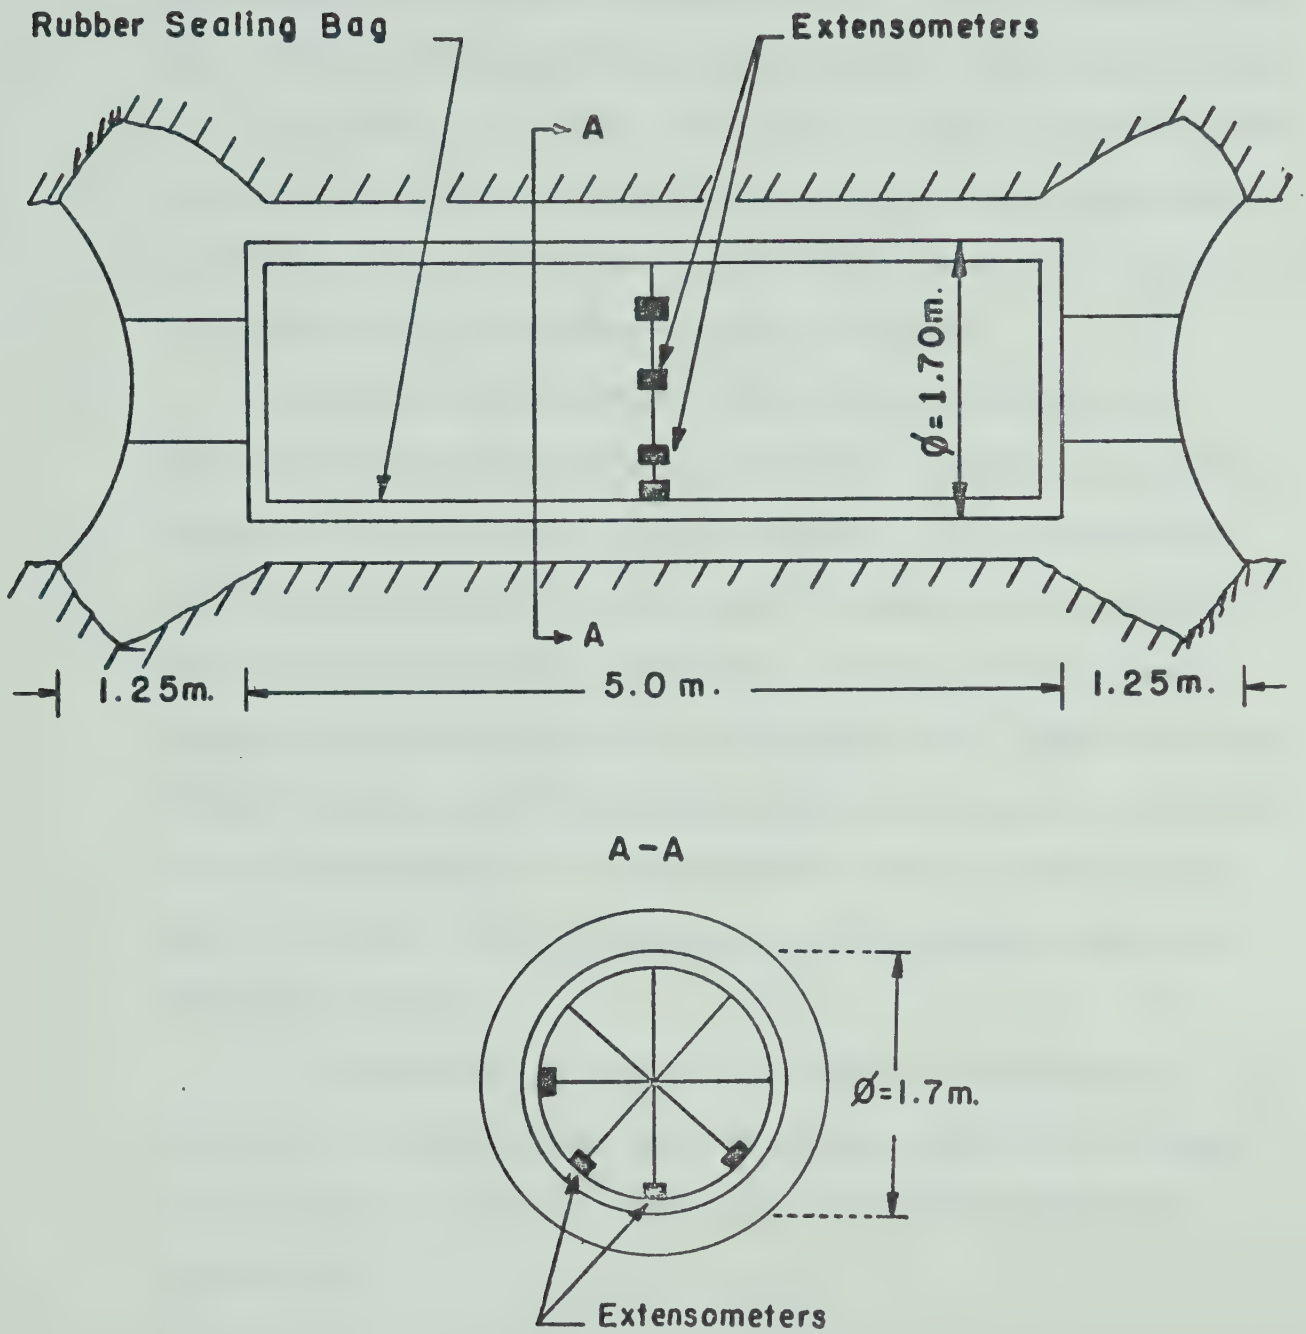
HYDRAULIC CHAMBER TEST SET-UP
